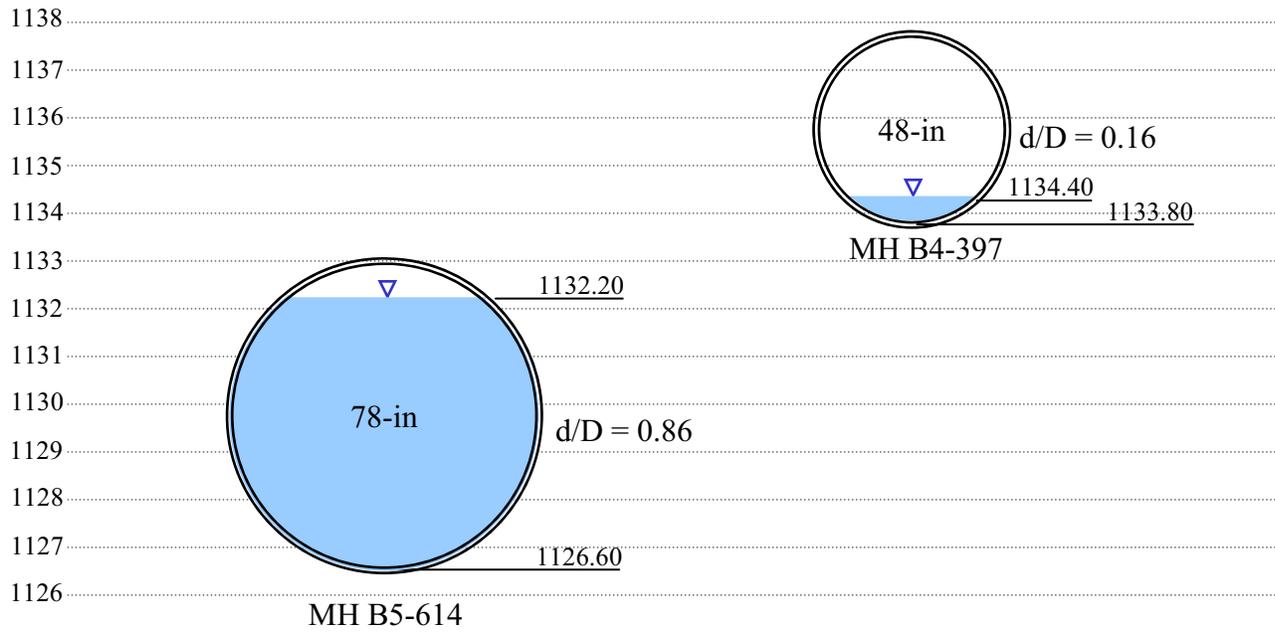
Hydraulic Profile of Existing System – Tier I Conditions
